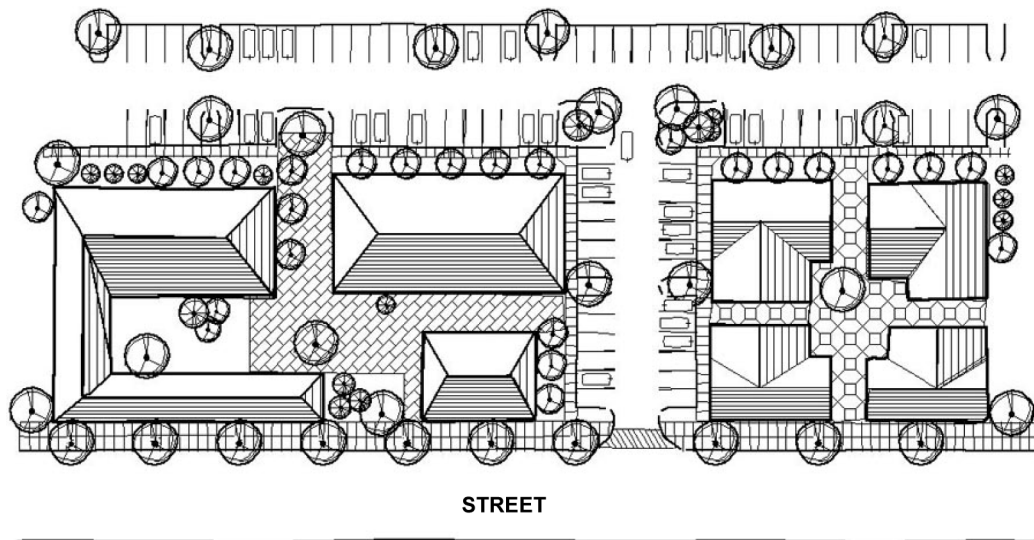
Shared parking lots, located to the side or rear of the building; parking to the rear is preferred. Landscaping strips buffer uses from parking lots.
